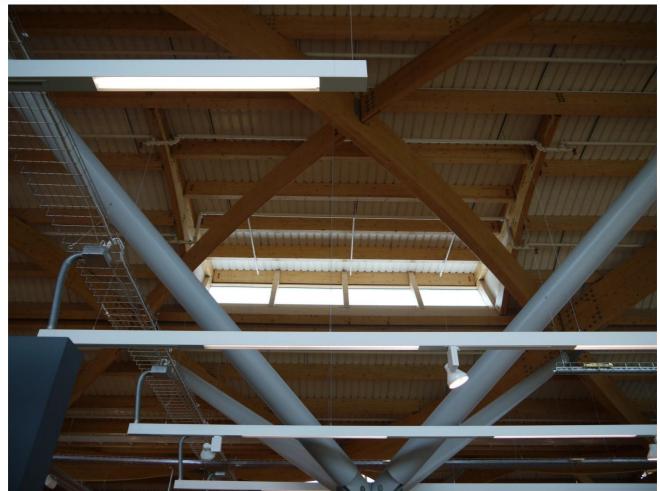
Internal roof showing steel support tree, glulam roof frame, track lighting and north light
